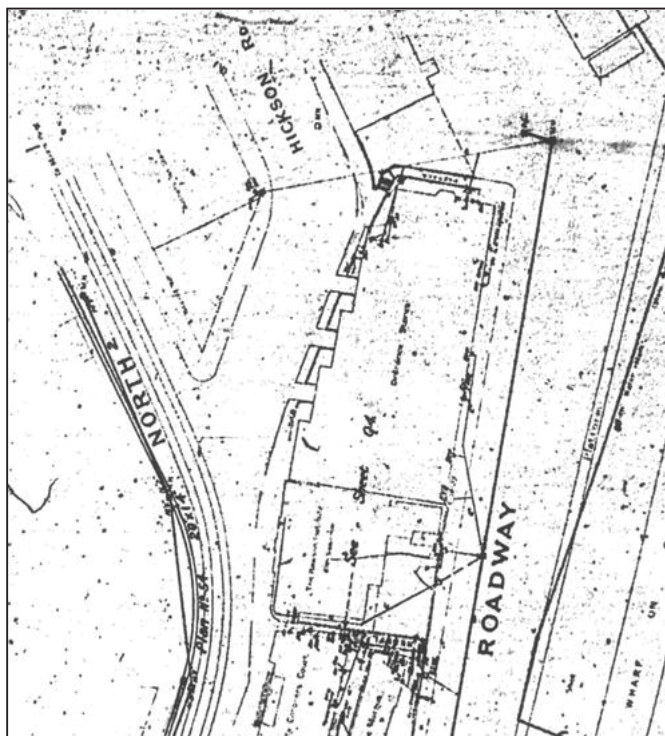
The footprint of the former ASN Co. Building is shown on this Sewer Detail Sheet, c1920.
